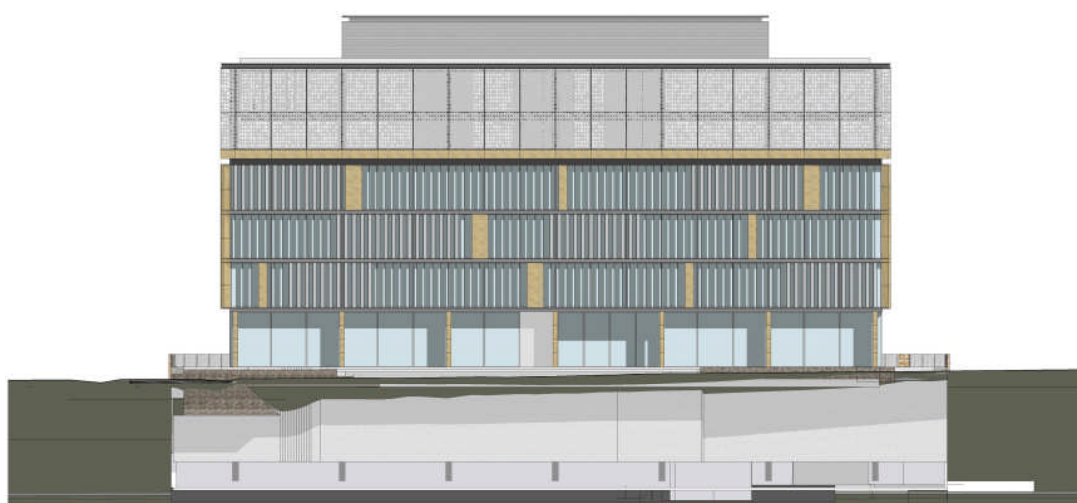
The proposed eastern facade of the building on Mann Street showing the Plant Room and the three lower levels of car parking. (Source - Group GSA Pty Ltd)
